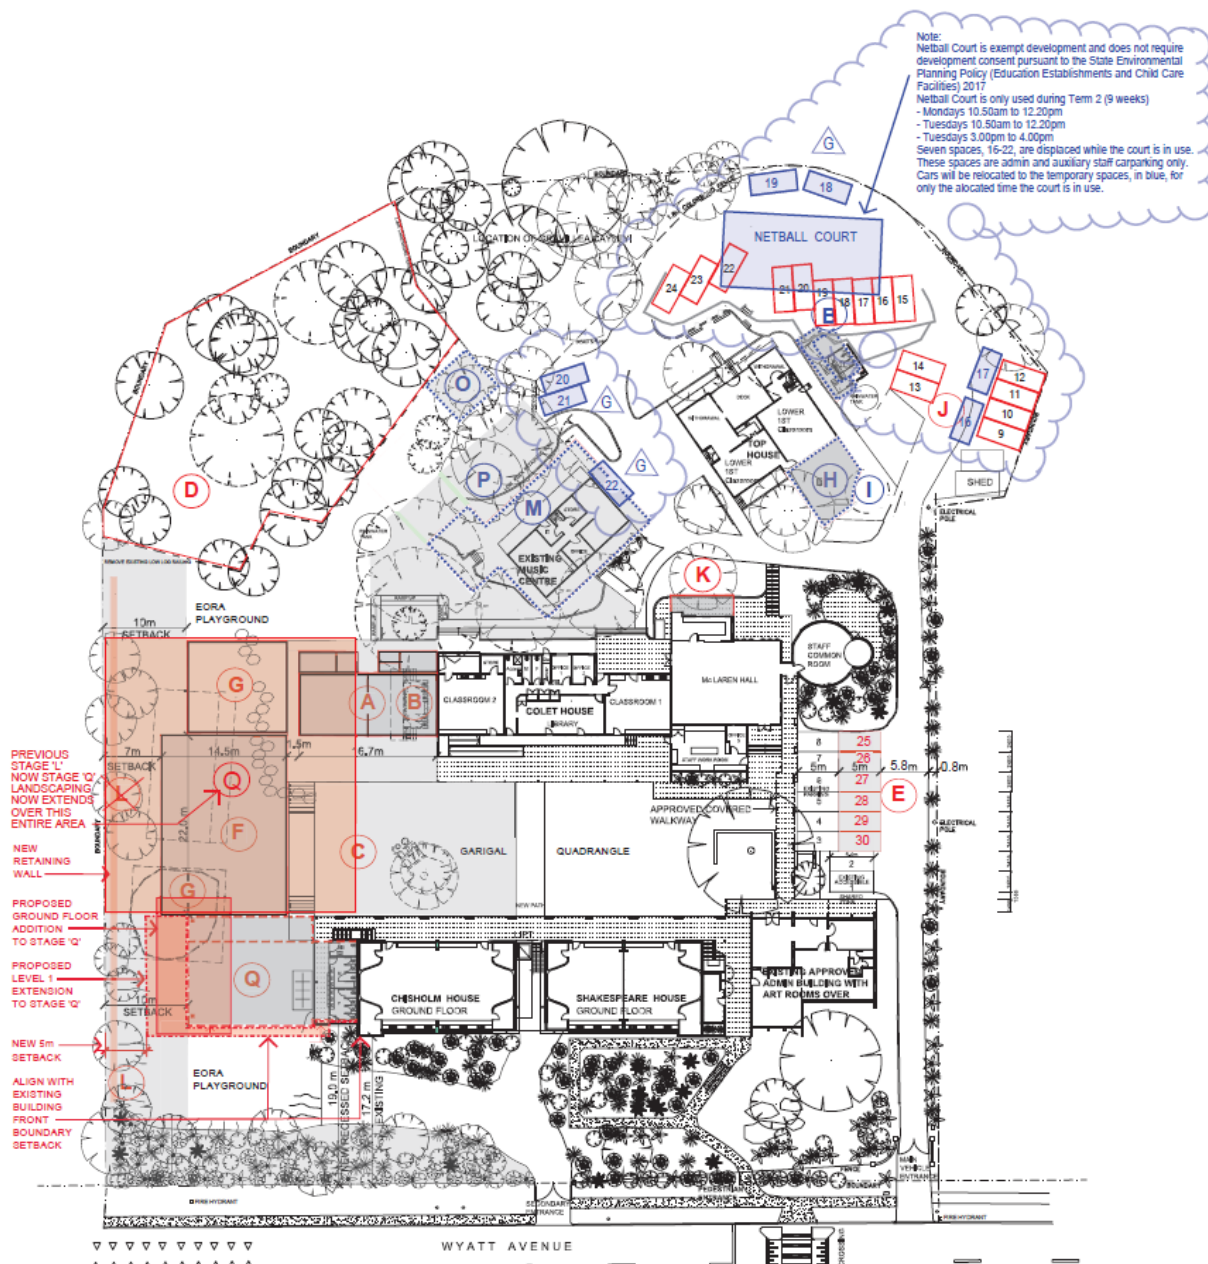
Amended site plan, illustrating the amended parking layout at the rear in red and temporary spaces shaded blue (Source: Templum Design Architects)
